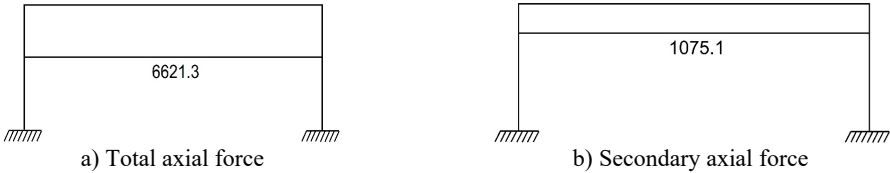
Comprehensive axial force and secondary axial force of prestressed concrete frame beams
